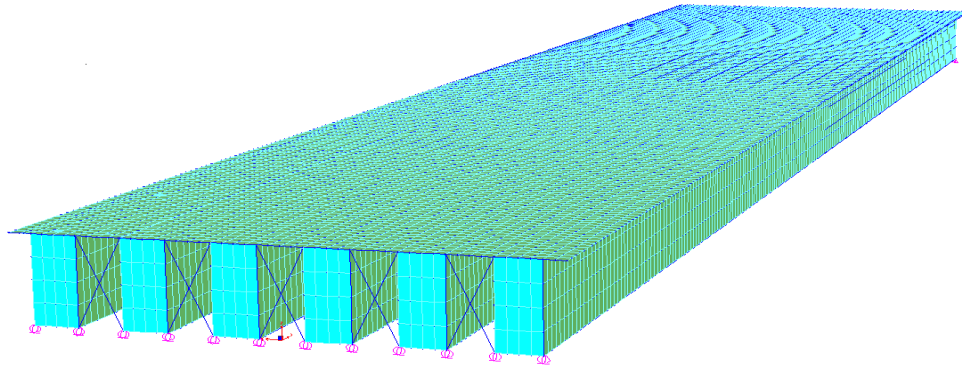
SAP2000 model view for composite multi-box girder bridges
